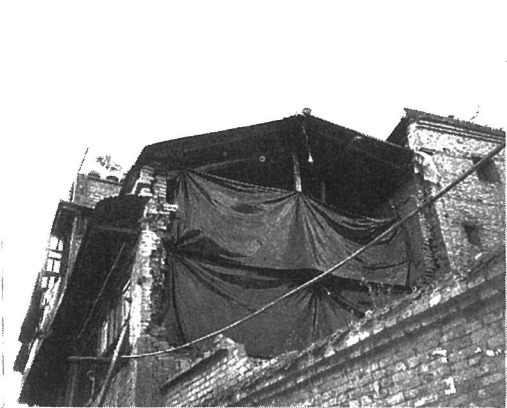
Collapse of the gable wall of a brick masonry building; example 2, Bhaktapur, Nepal
